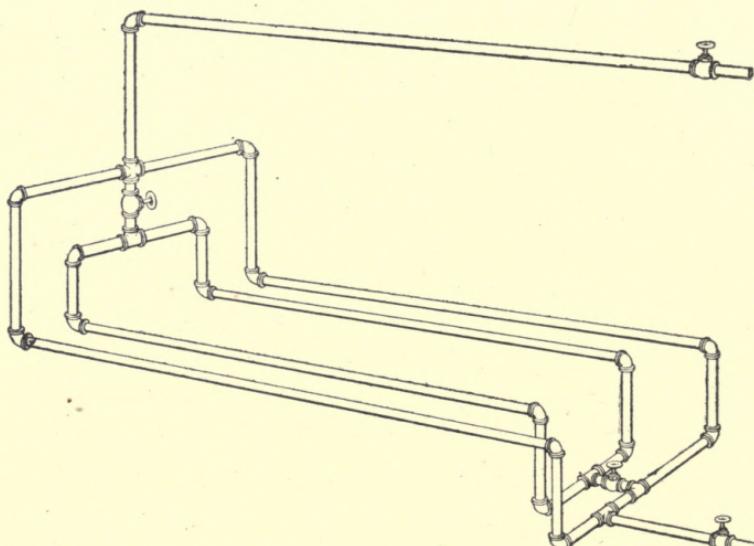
Connections of Inner Groups of Pipes of Greenhouse Shown in Fig. 175.
